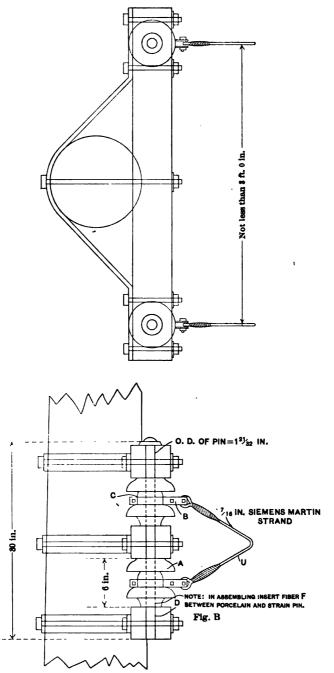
Detail B of Fig. 17 showing method of attachment of cross-catenary to pole
